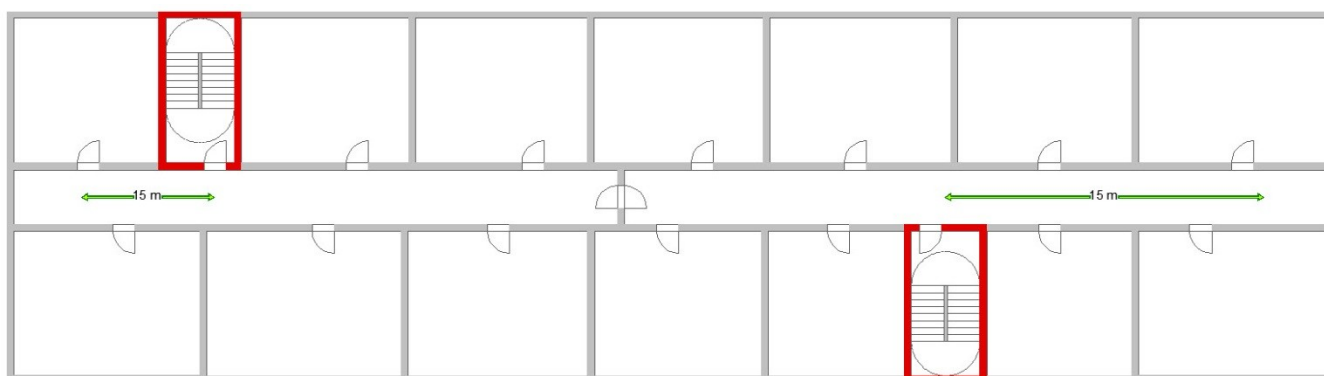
Protected staircase in a building with a BTP of individual floors less than 900 m^2
